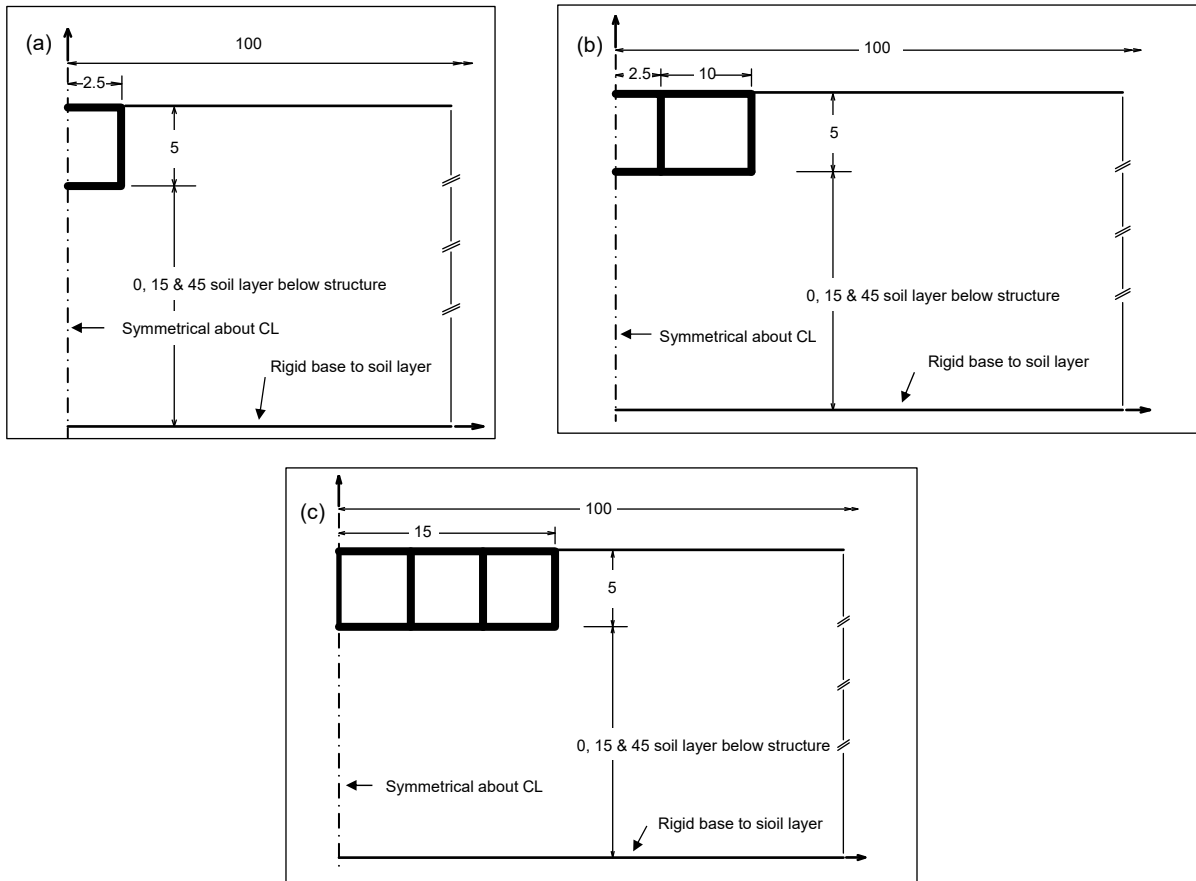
Geometry of basement wall models. (a) 5 m width, (b) 15 m width and (c) 30 m width.
